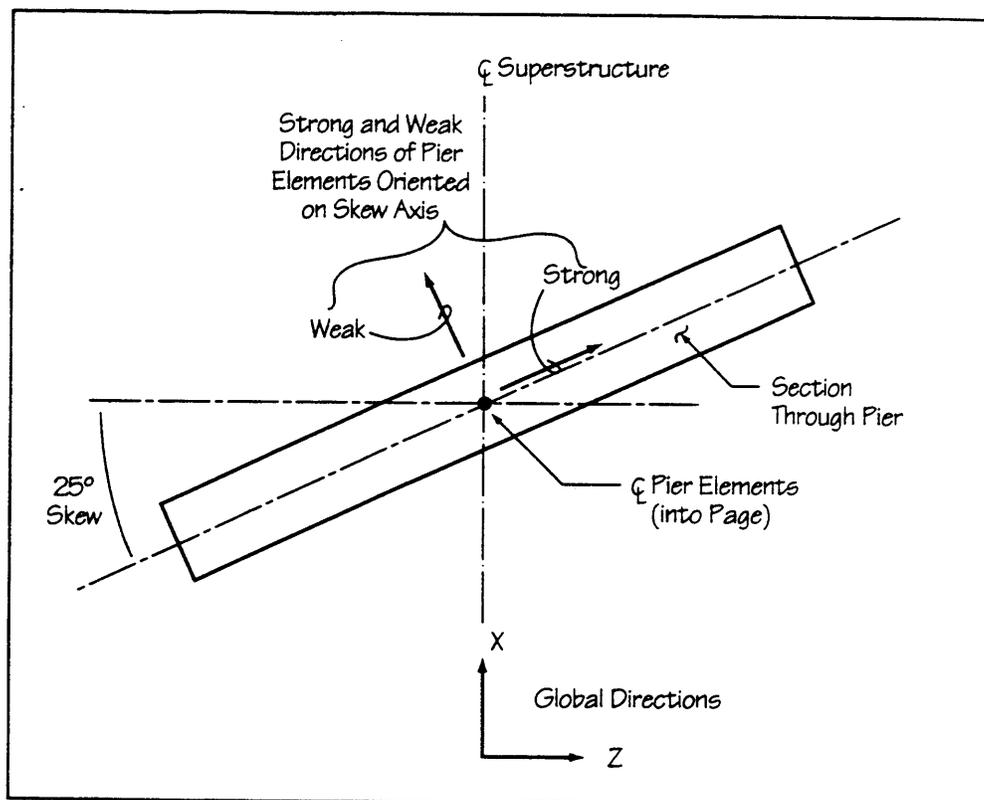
Plan of Pier Showing Rotation of Pier Elements
